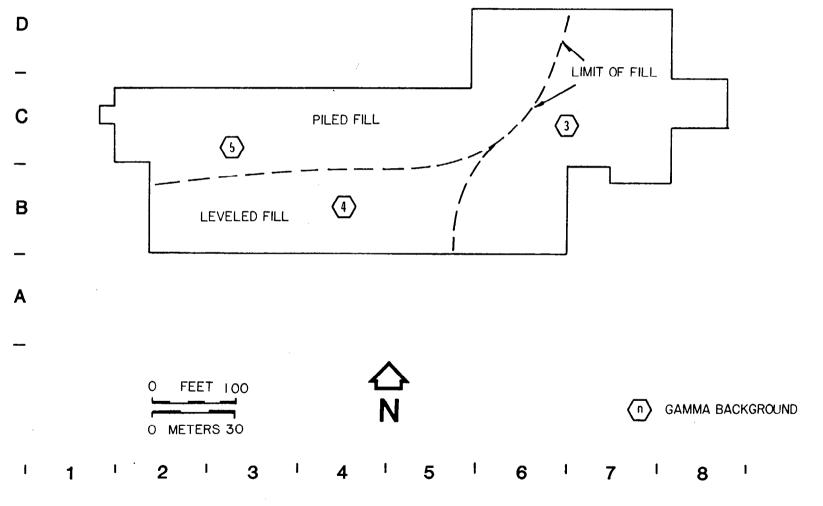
Site 41 - Survey Plan. ANL-HP Dwg. No. 83-67
